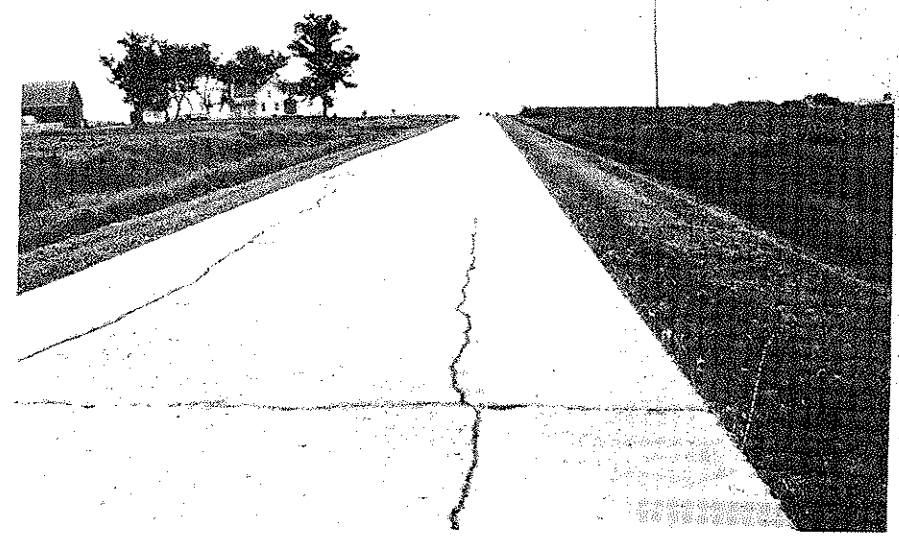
TYPICAL PAVEMENT CONDITION OF THE 6"
